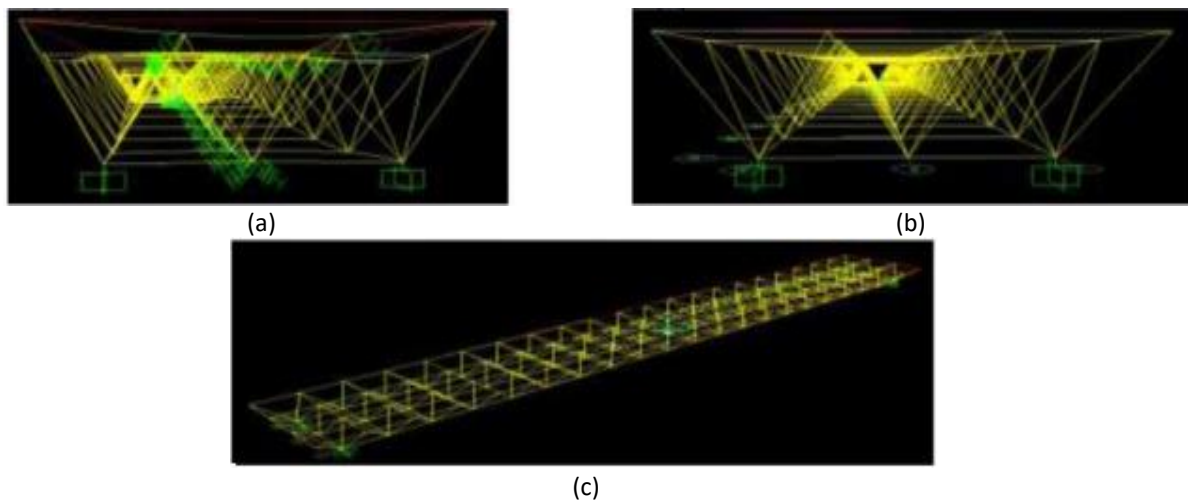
Truss bridge structure (a) by using damper (b) without damper (c) full structure of the bridge
